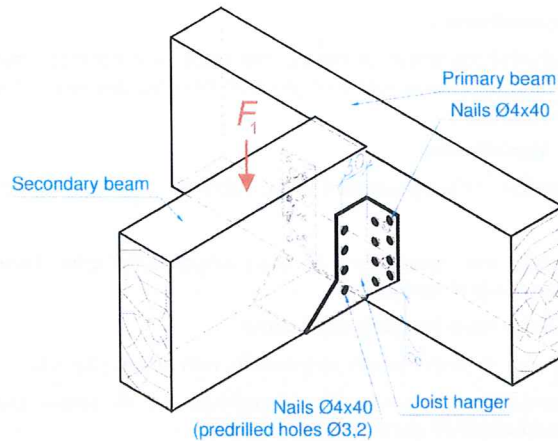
Typical installation of the joist hanger in the timber beam to timber beam connections
